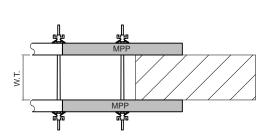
USING MPP TO CONNECT FORMWORK TO EXISTING WALL
